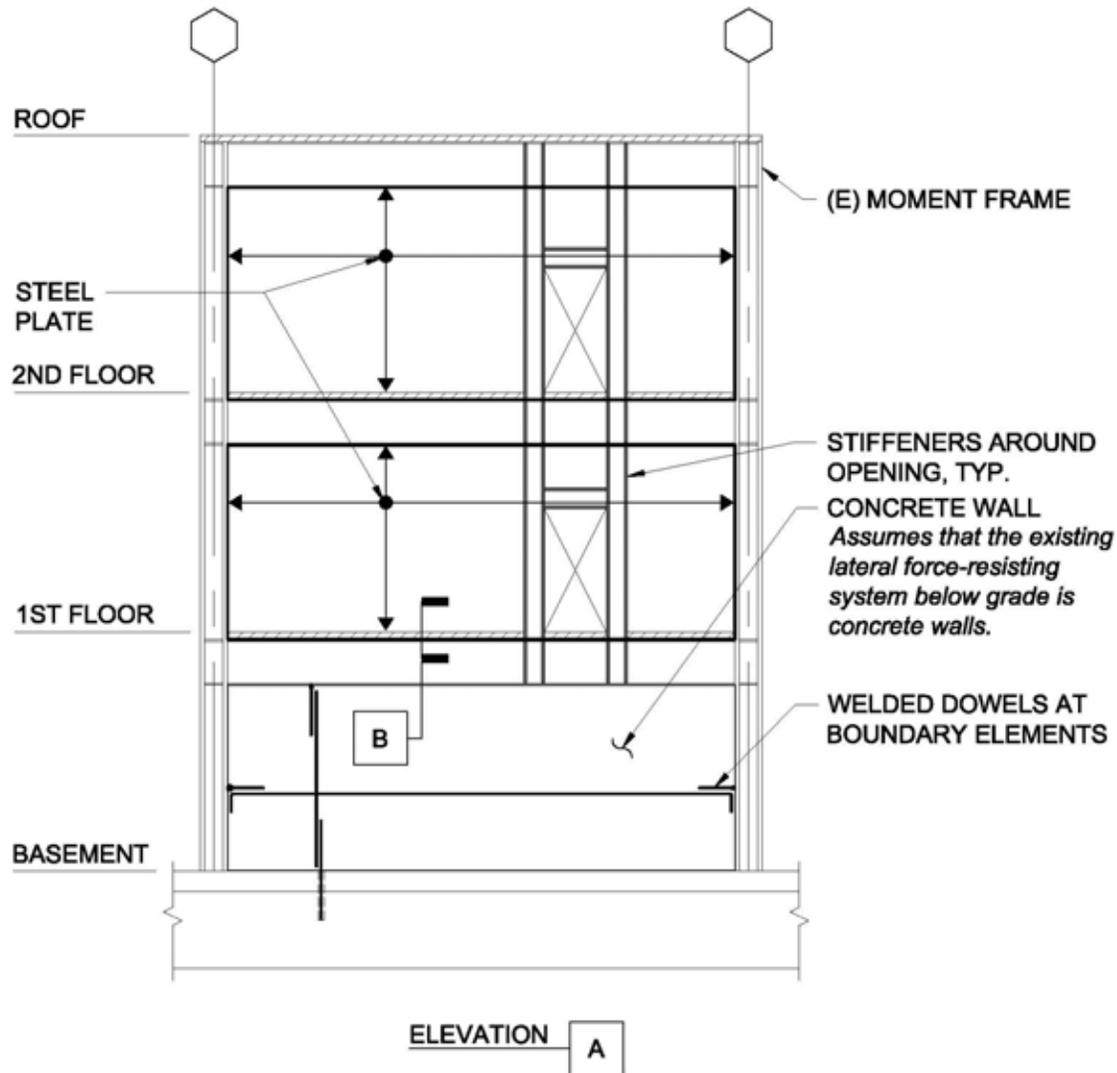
A: Unstiffened Steel Plate Shear Wall
